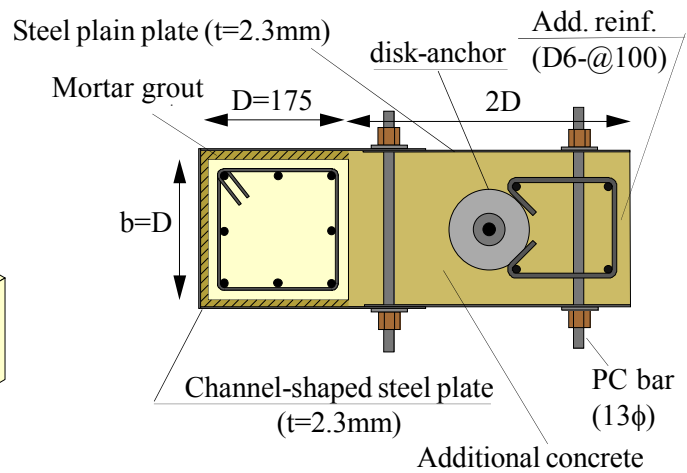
Detail of retrofit scheme of specimen R08P-WA (unit:mm)
